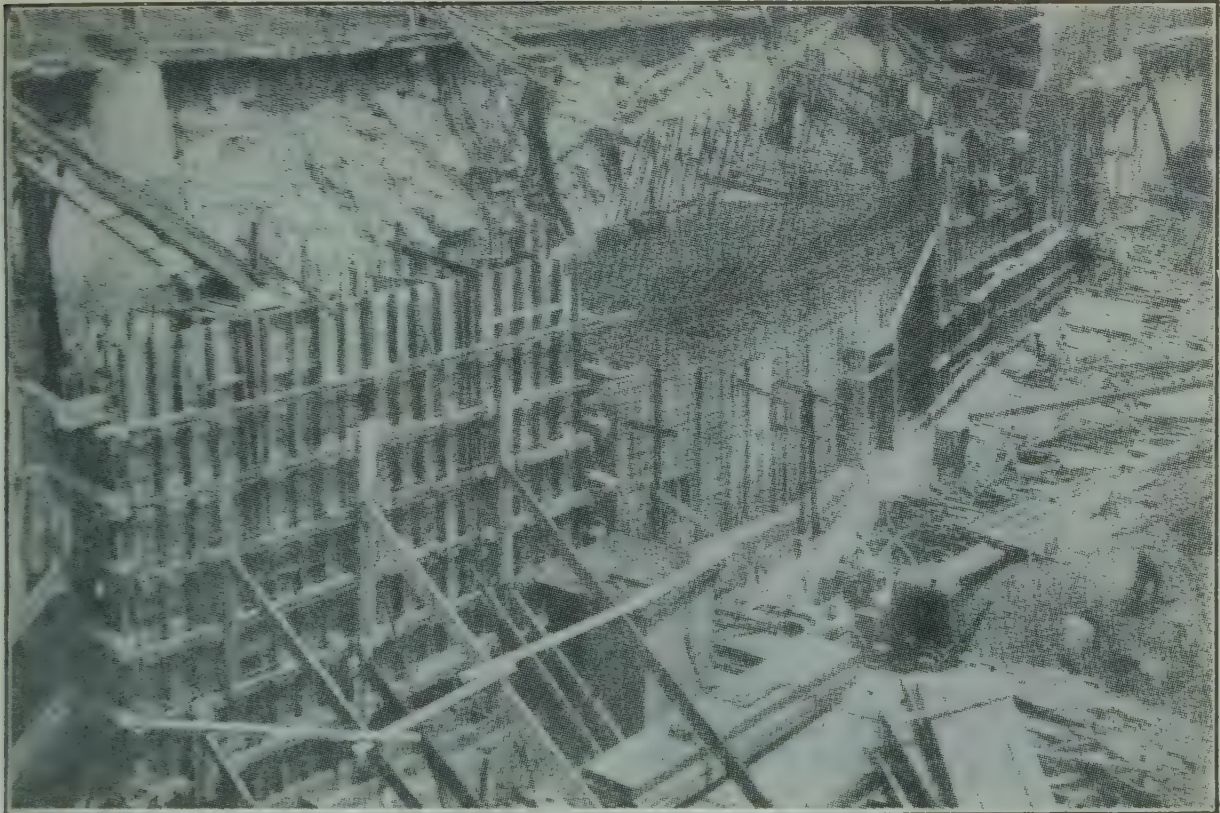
Construction of retaining walls, Exit Plaza of the Lincoln Tunnel, New York City.
